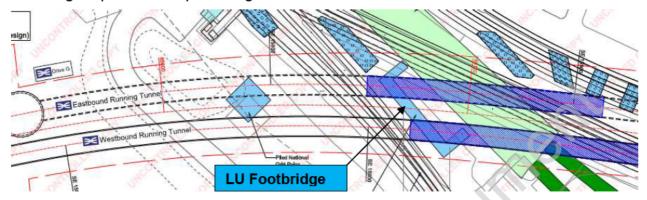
Crossrail bored tunnels alignment in reference to the LU Footbridge over the DRL tracks at the Canning Town Junction
